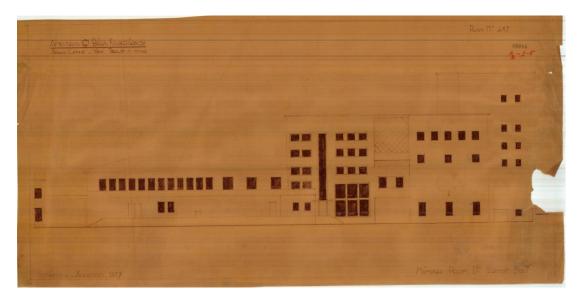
The south elevation drawing of the first proposal indicating the terrace roofs over the five storey dwelling and production units, 1937, Egli (Source: TTA Archive)
